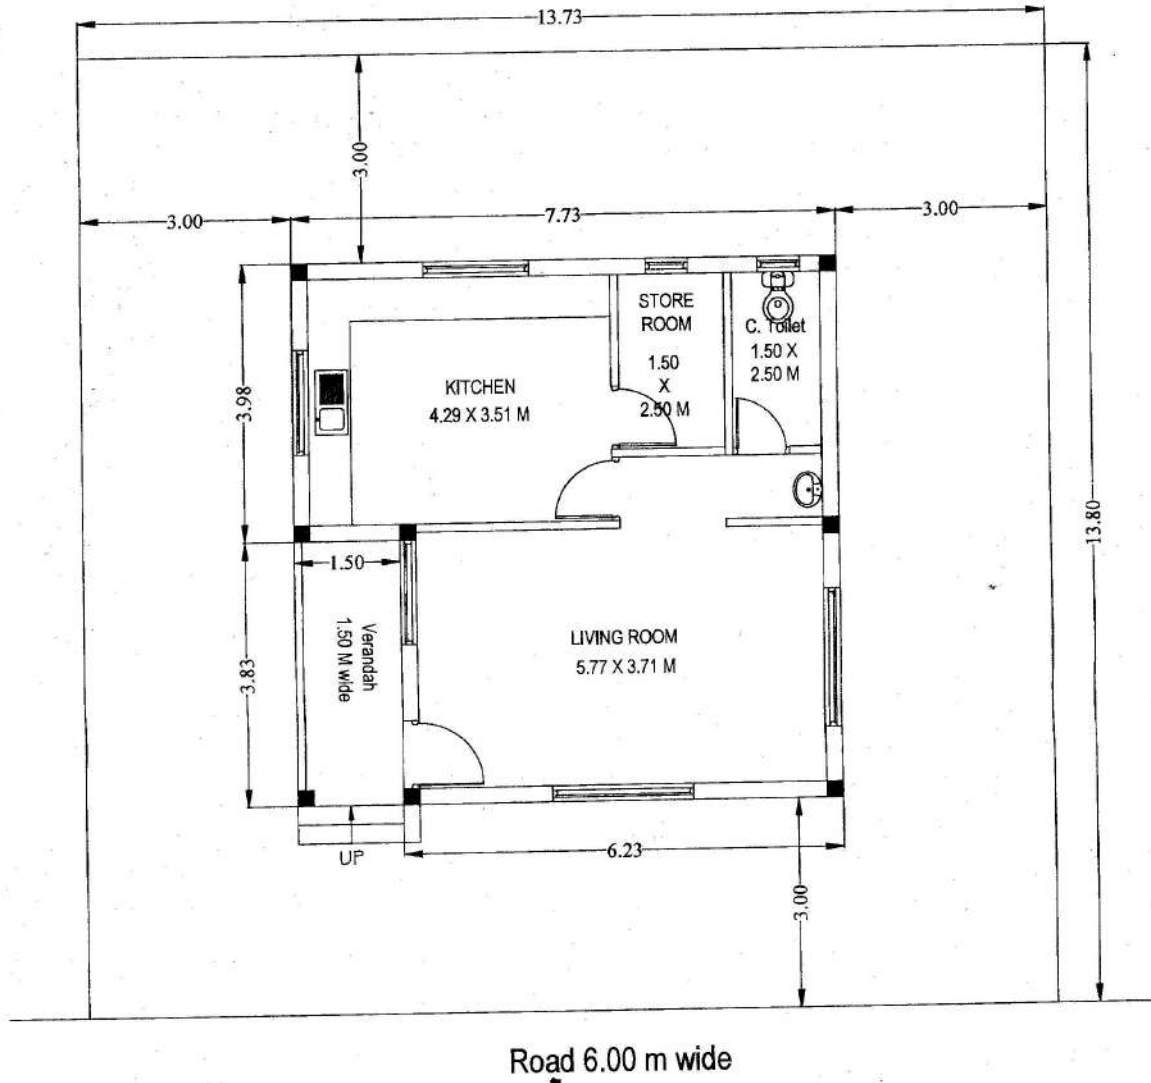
GROUND FLOOR PLAN OF HOUSE
